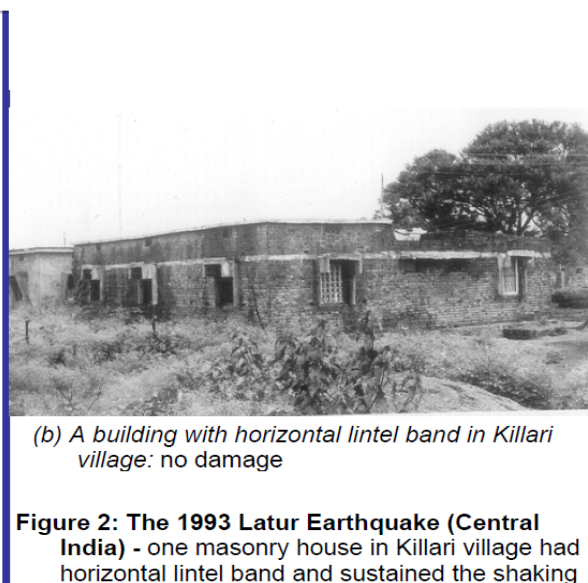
The 1993 Latur Earthquake (Central India) - one masonry house in Killari village had horizontal lintel band and sustained the shaking
